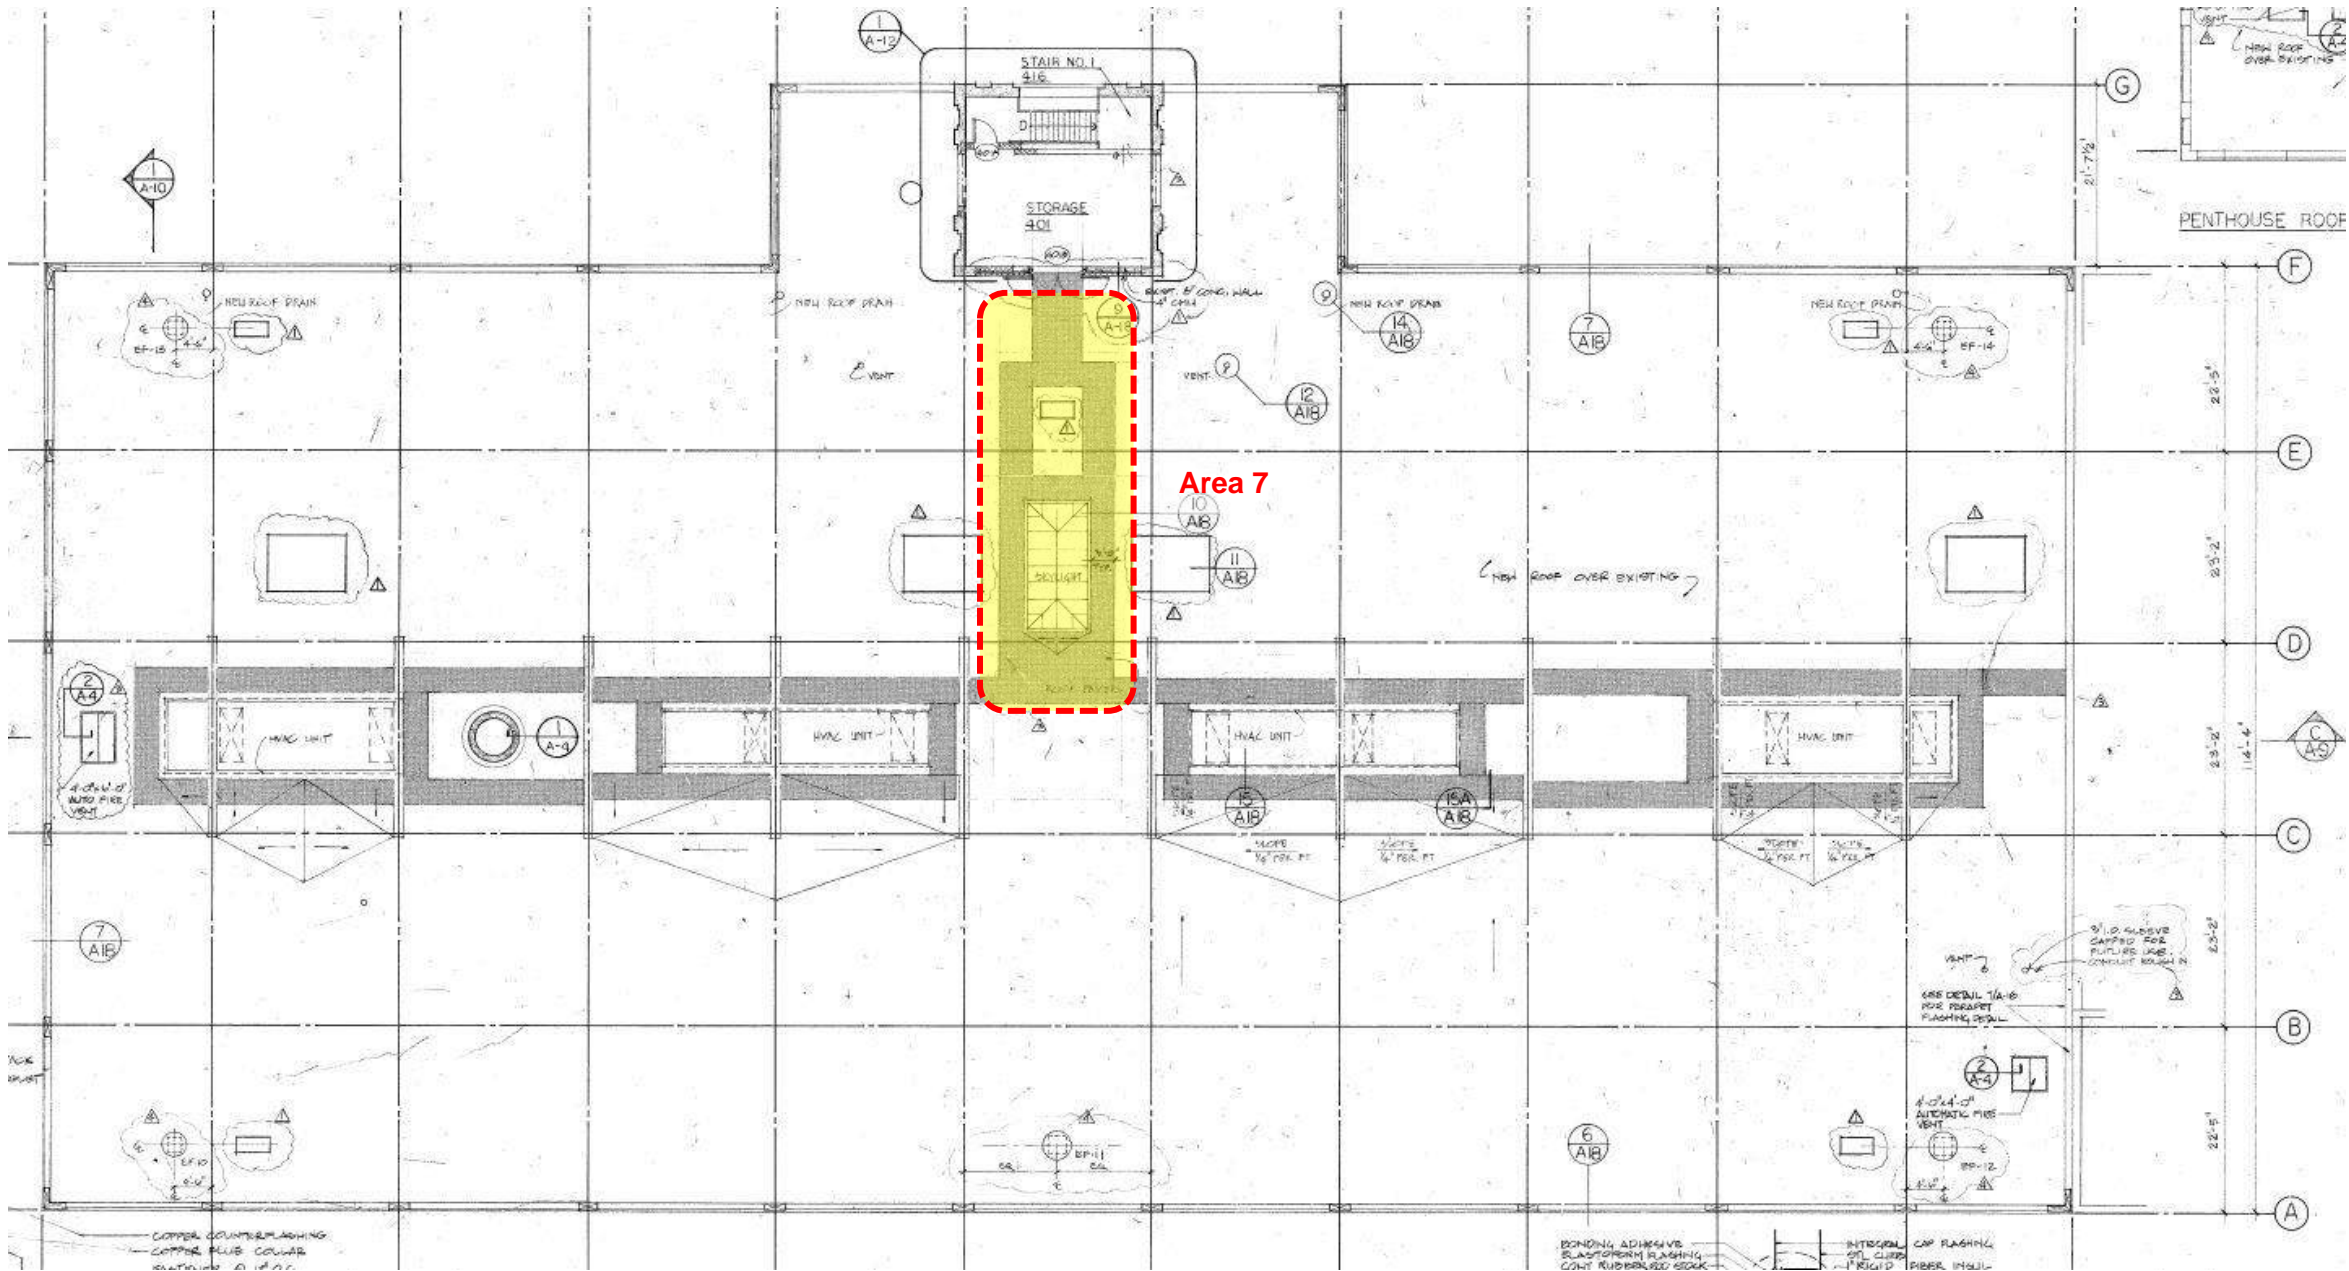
D – ROOF PLAN – CBZ AREA 7:
